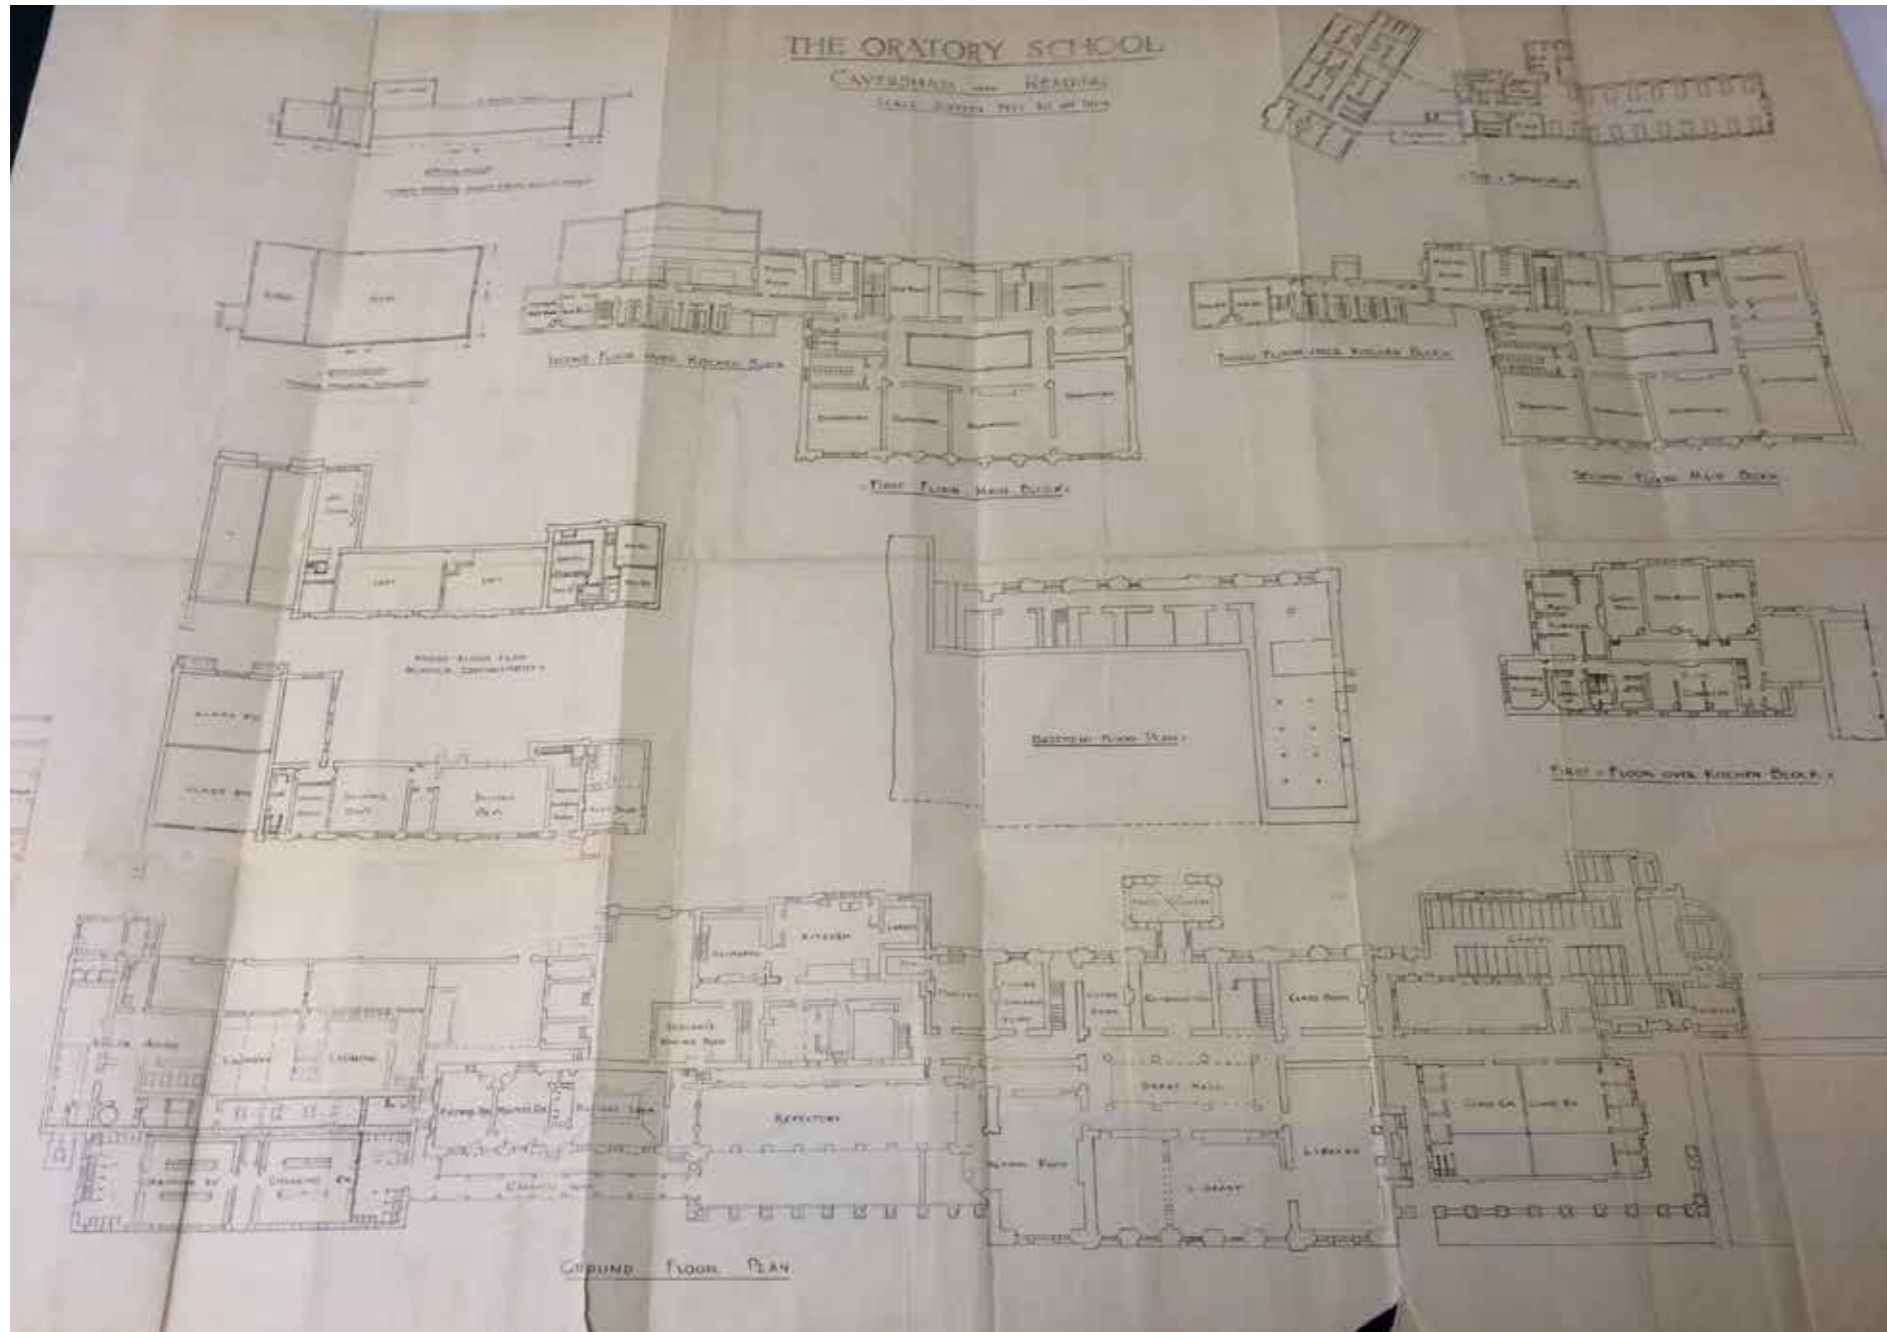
Ground floor plan, BBC archives, c.1922 to 1940s
